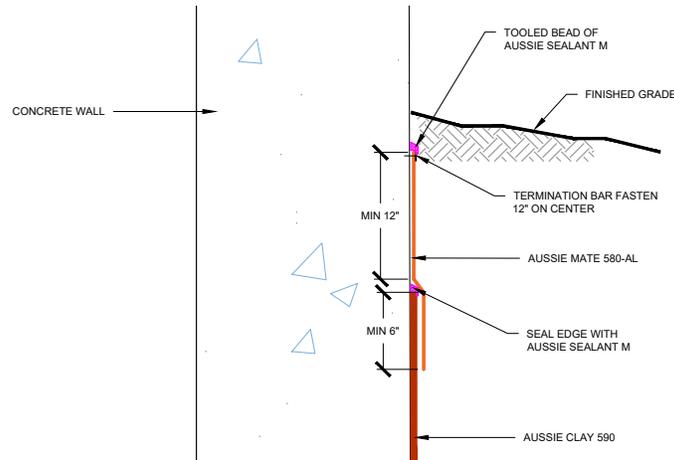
GRADE TERMINATION WITH FLASHING
